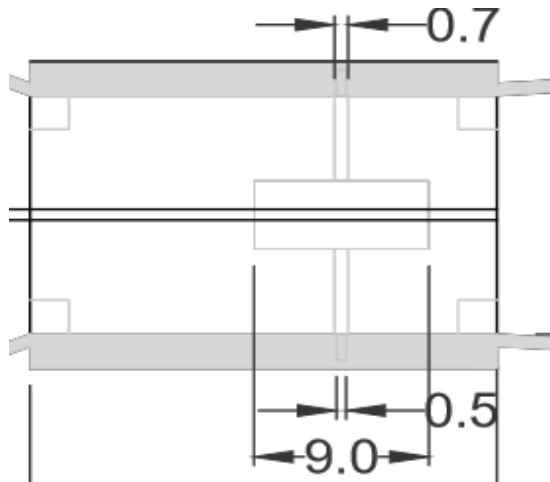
Here, the top view of the test section is shown. The placement of the square section of the dowel inside a pit in the wall can be seen. The sensors will also be placed inside this pit. All labeled measurements are in cm.
